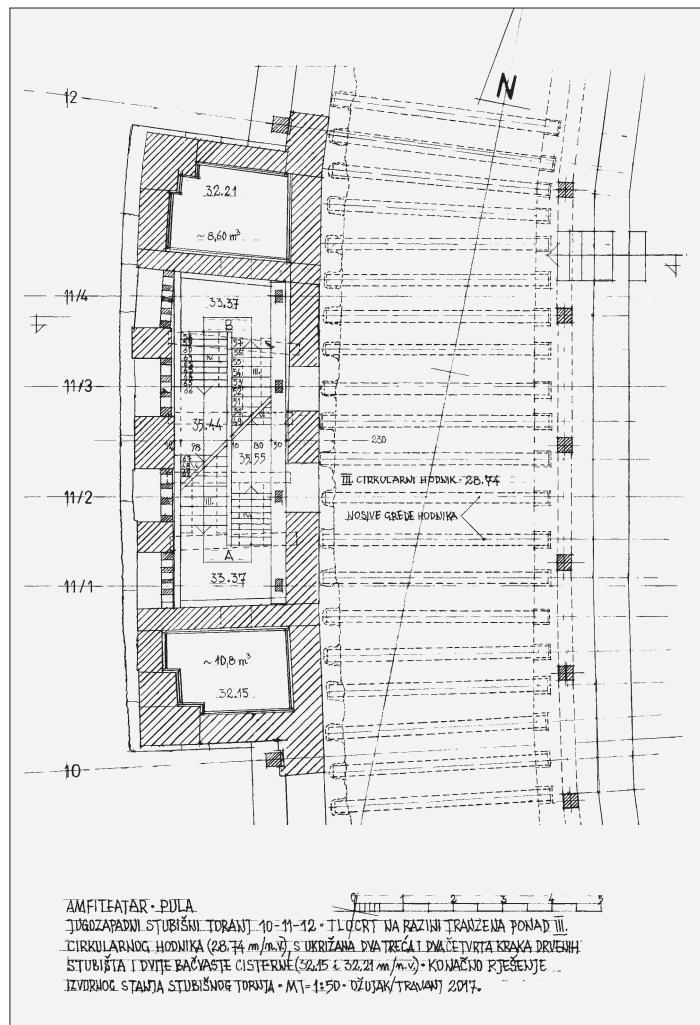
STAIRCASE TOWER 10-11-12, PLAN OF THE LEVEL
